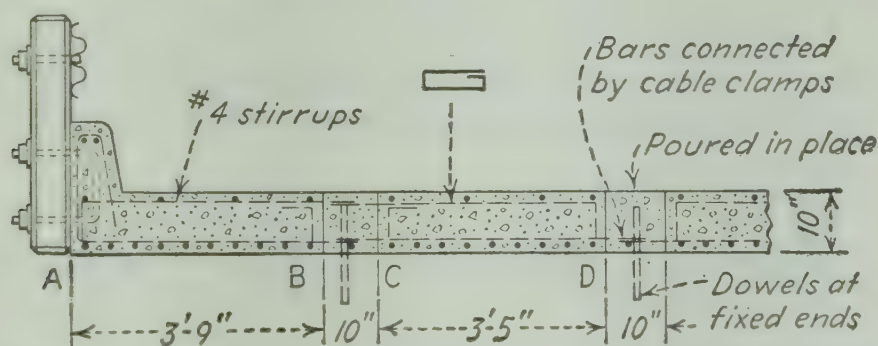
Precast units 15 ft long used for some bridges built by Florida State Road Department.
